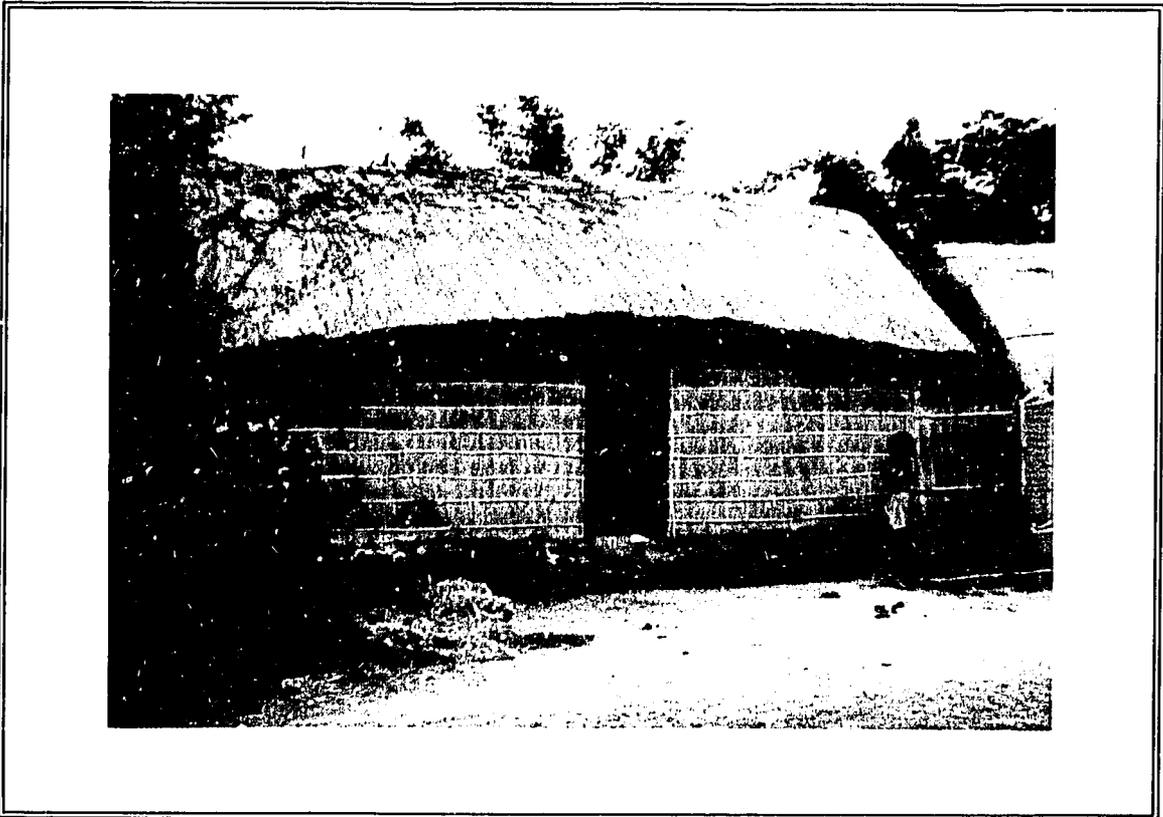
Homestead living quarters. The raised floor plinth is a typical precaution against flooding, and the grass planted on the plinth protects its side slopes from wave action and rain.
